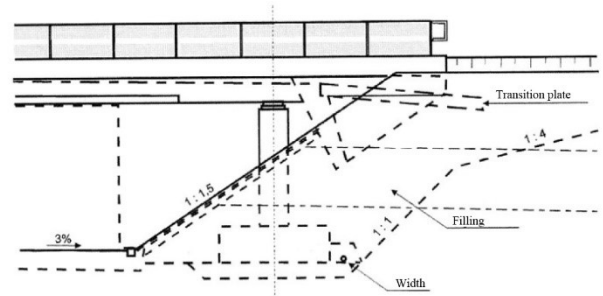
Transitional section in the embankment of the newly built railway line with reinforced concrete slab (Finnish railways) [12].
